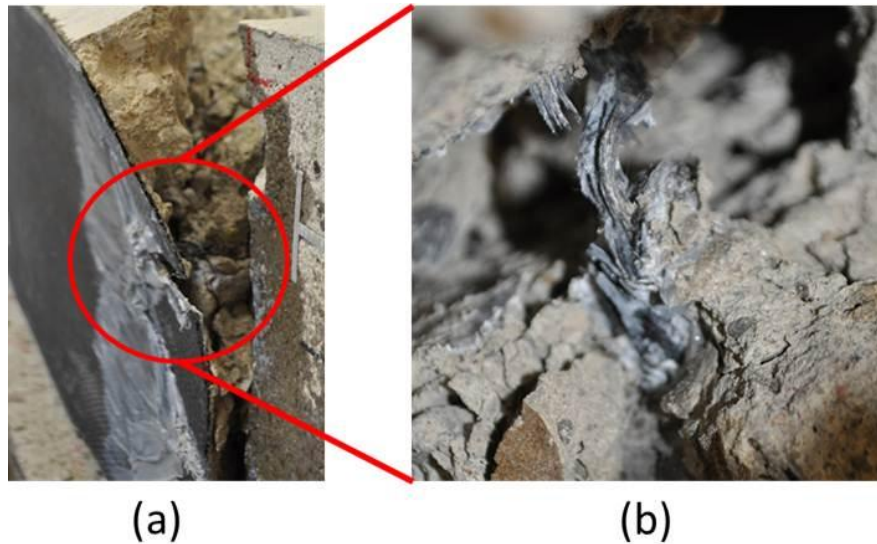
FRP anchor pry-out with local concrete failure
